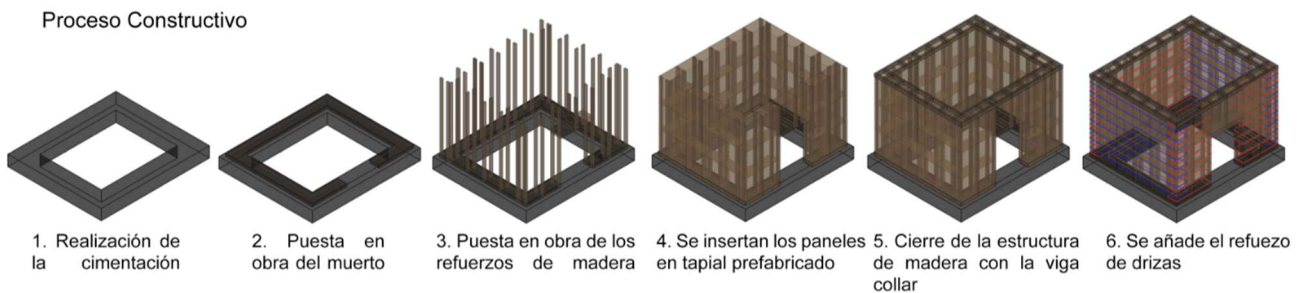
First studies on the construction process with prefabricated rammed earth panels.
